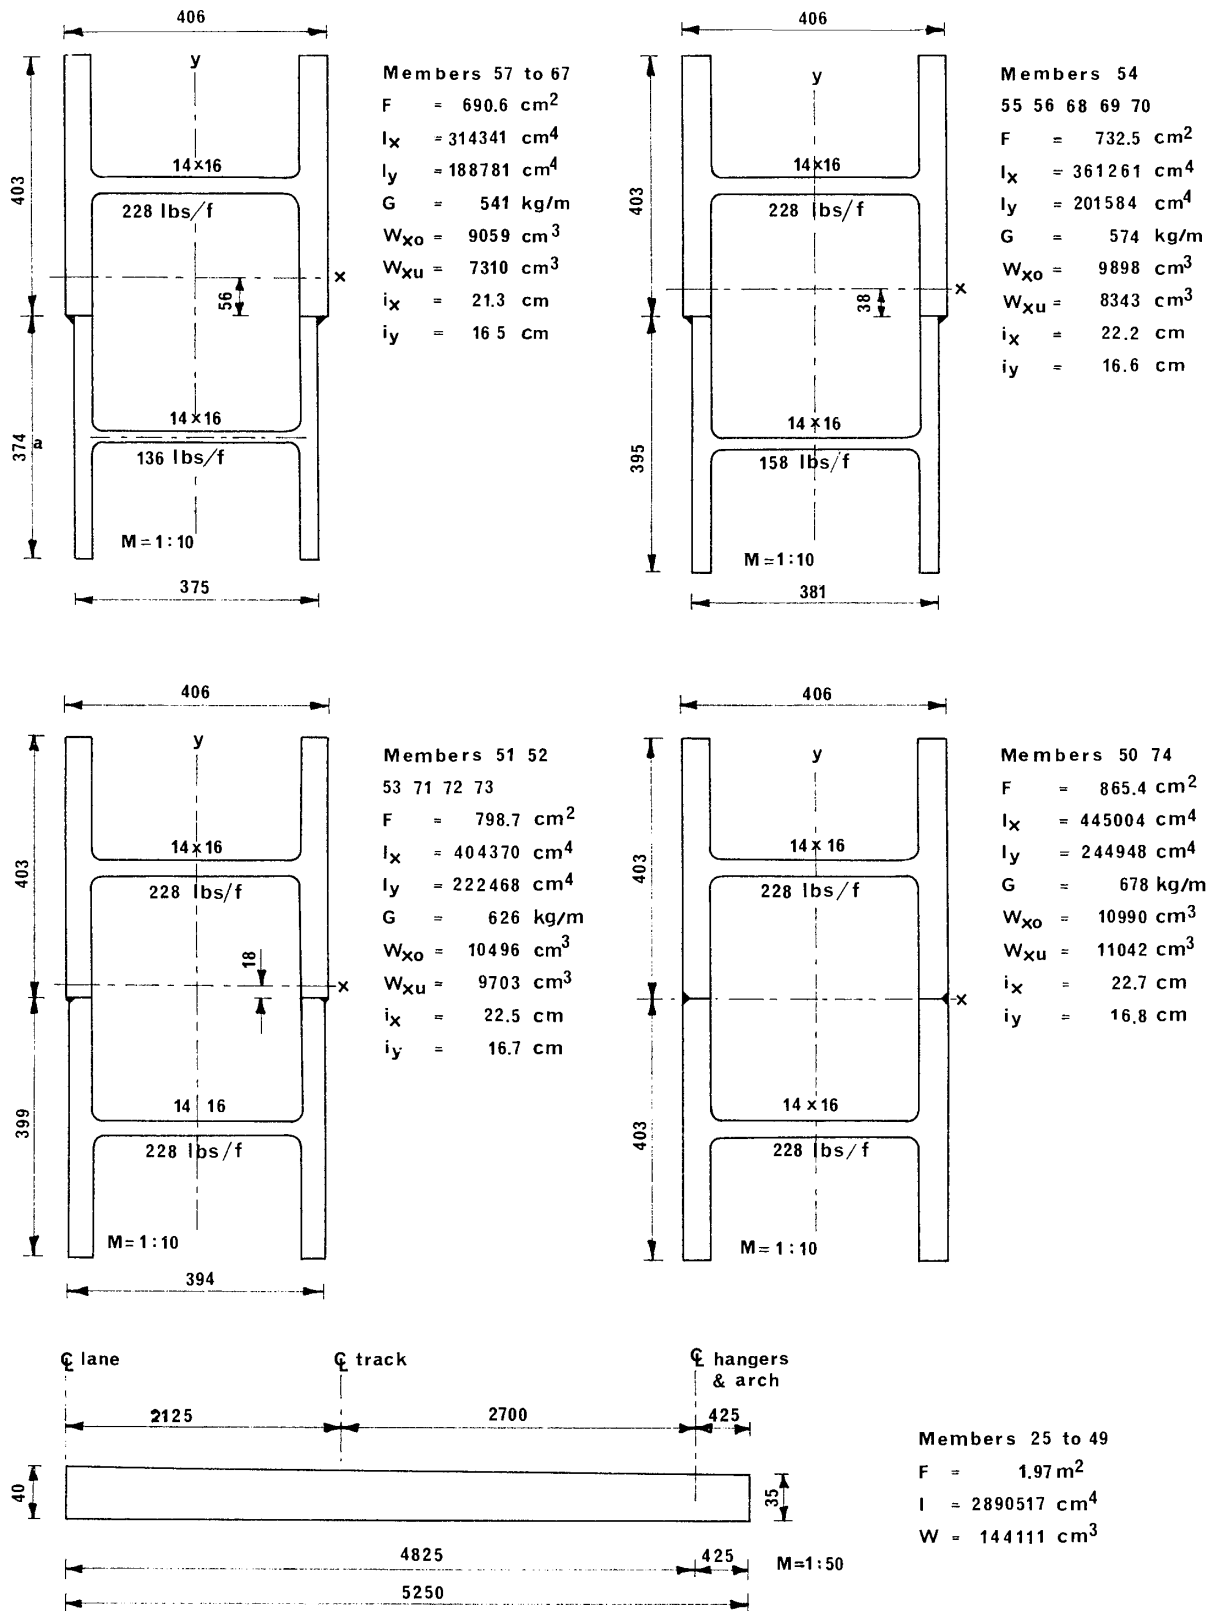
Cross-section of arch and lane for suggested double track railway bridge. (Tveit 73).
